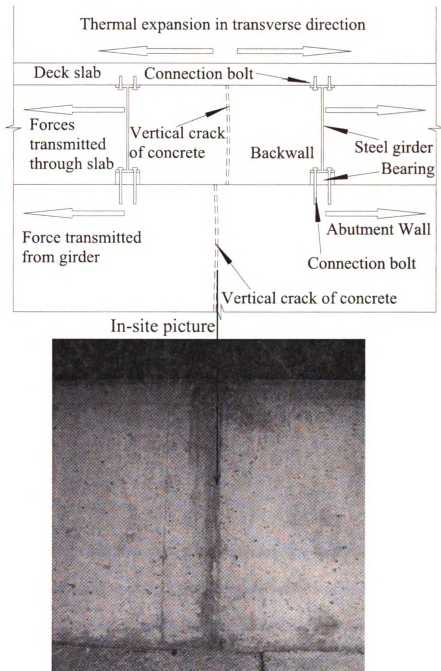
Bridge abutment damage with their possible causes
